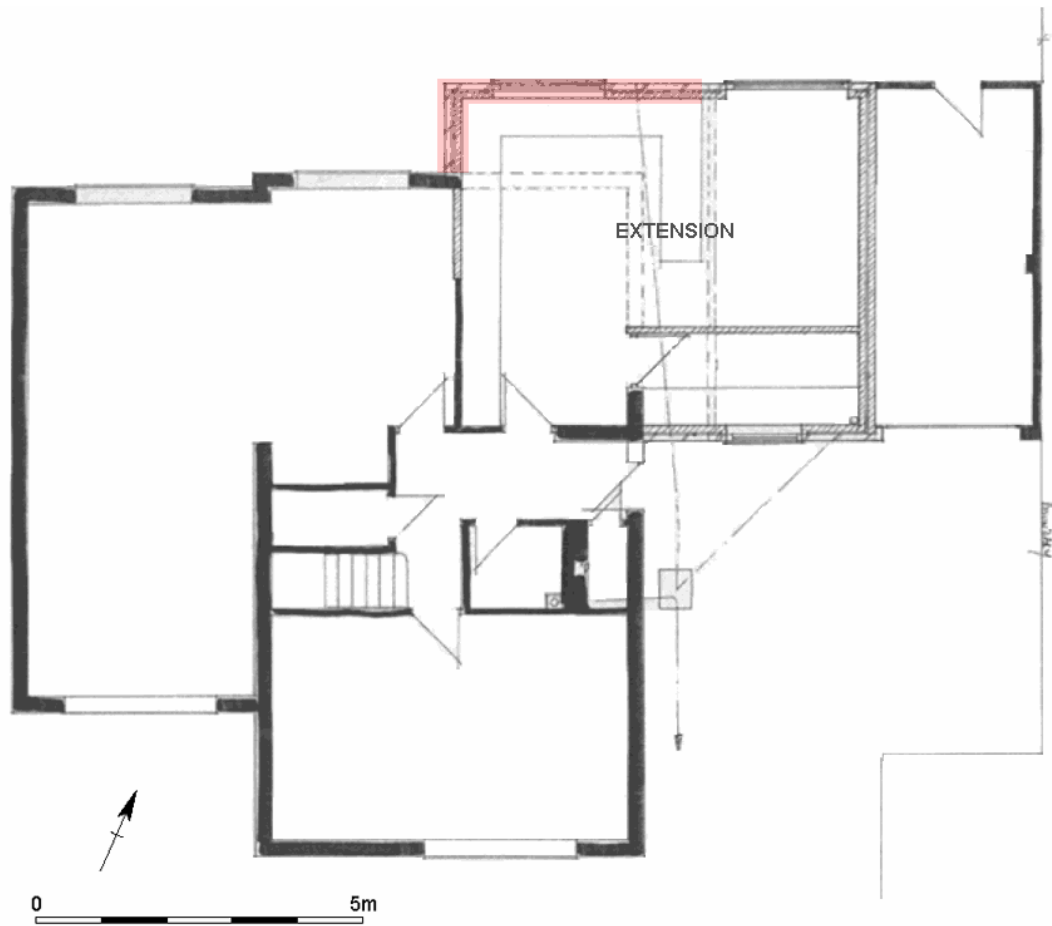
Proposed development: extent of footing observed in red (*scale as shown*)
